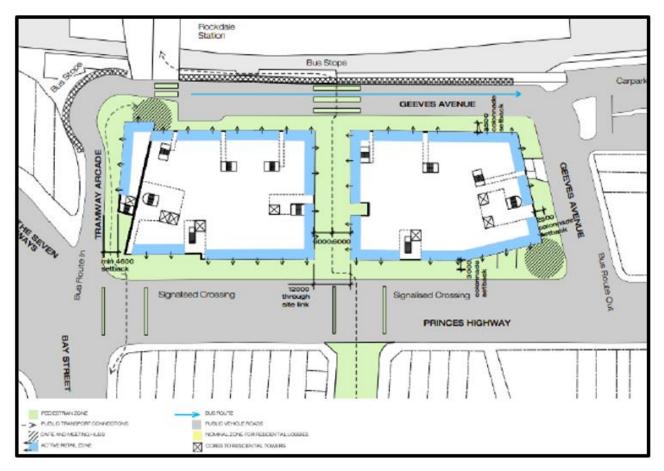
Proposed site plan showing pedestrian linkages and footpath widening (source Draft DCP)
